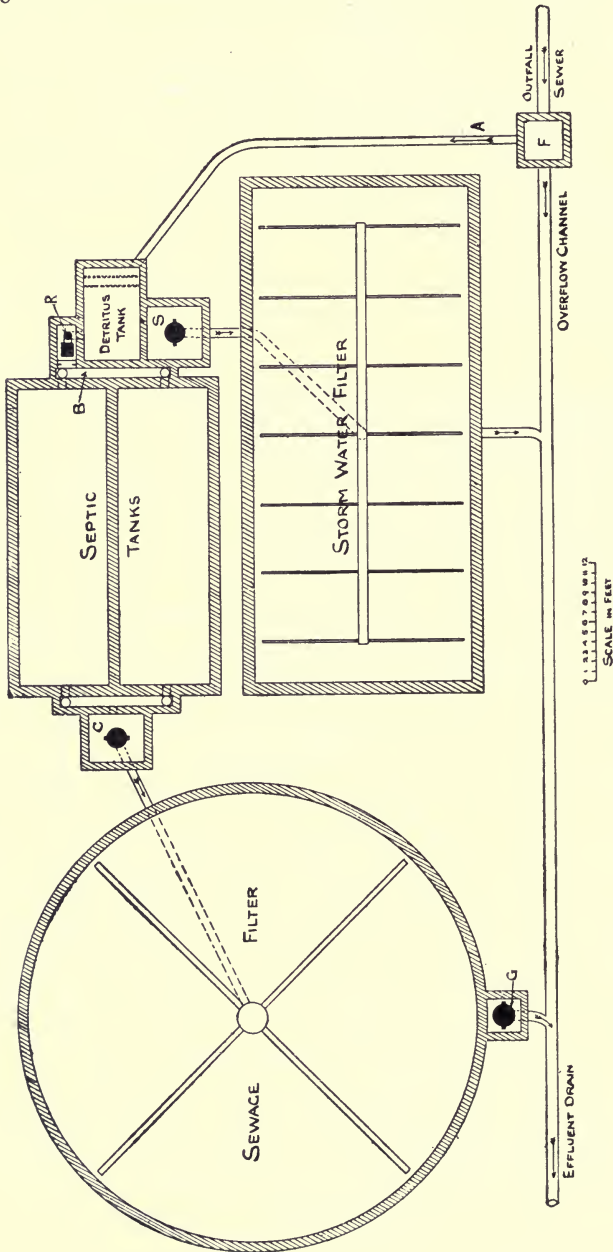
Plan of Small Sewage Disposal Works showing Application to the various Valves.
